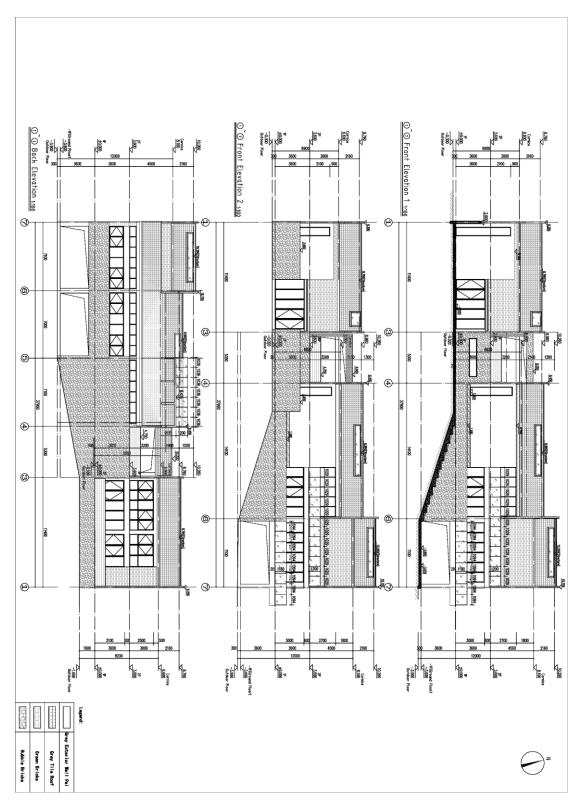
Two Front Elevations and Back Elevation of Tourist Reception Center (Drawn by the author)
